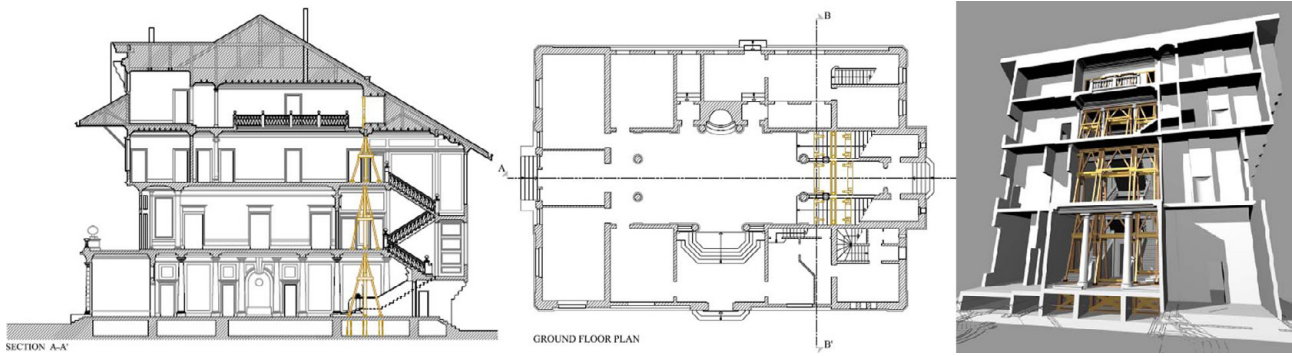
a)Section from the new system of emergency propping. b)Ground Floor Plan. c) 3D view of its placements.
